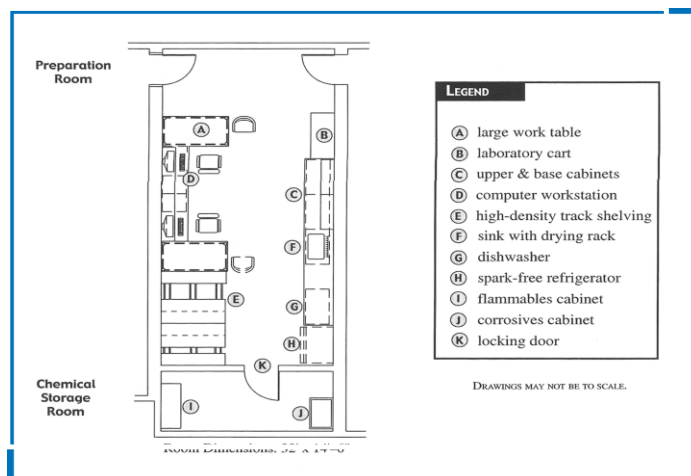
Prep / Storage Room Layout for Dual Classrooms³
